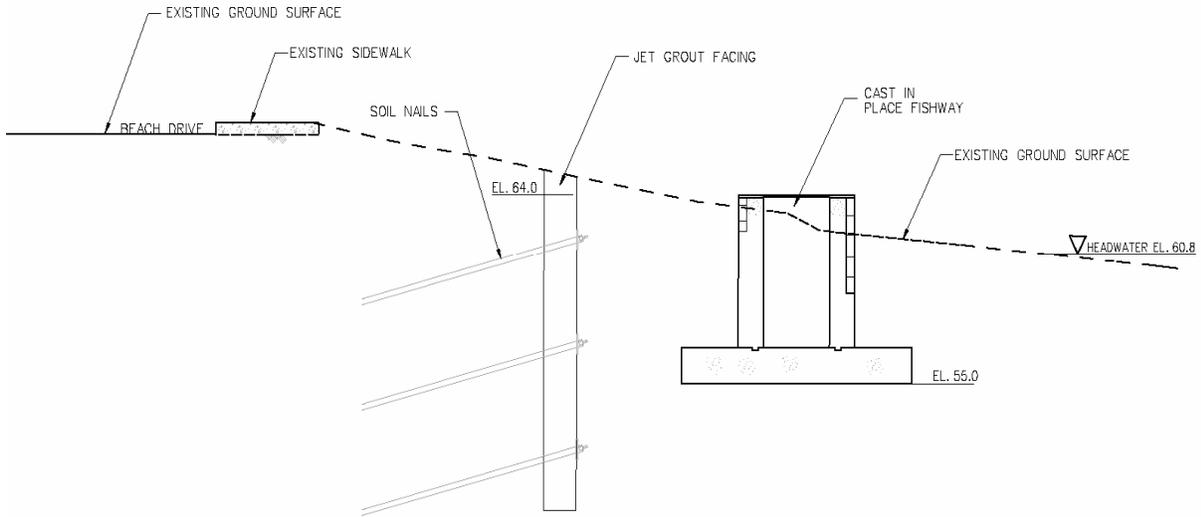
Cross Section A through Soil Nailed Wall and Upstream Exit of Fishway (KCI 2003)
